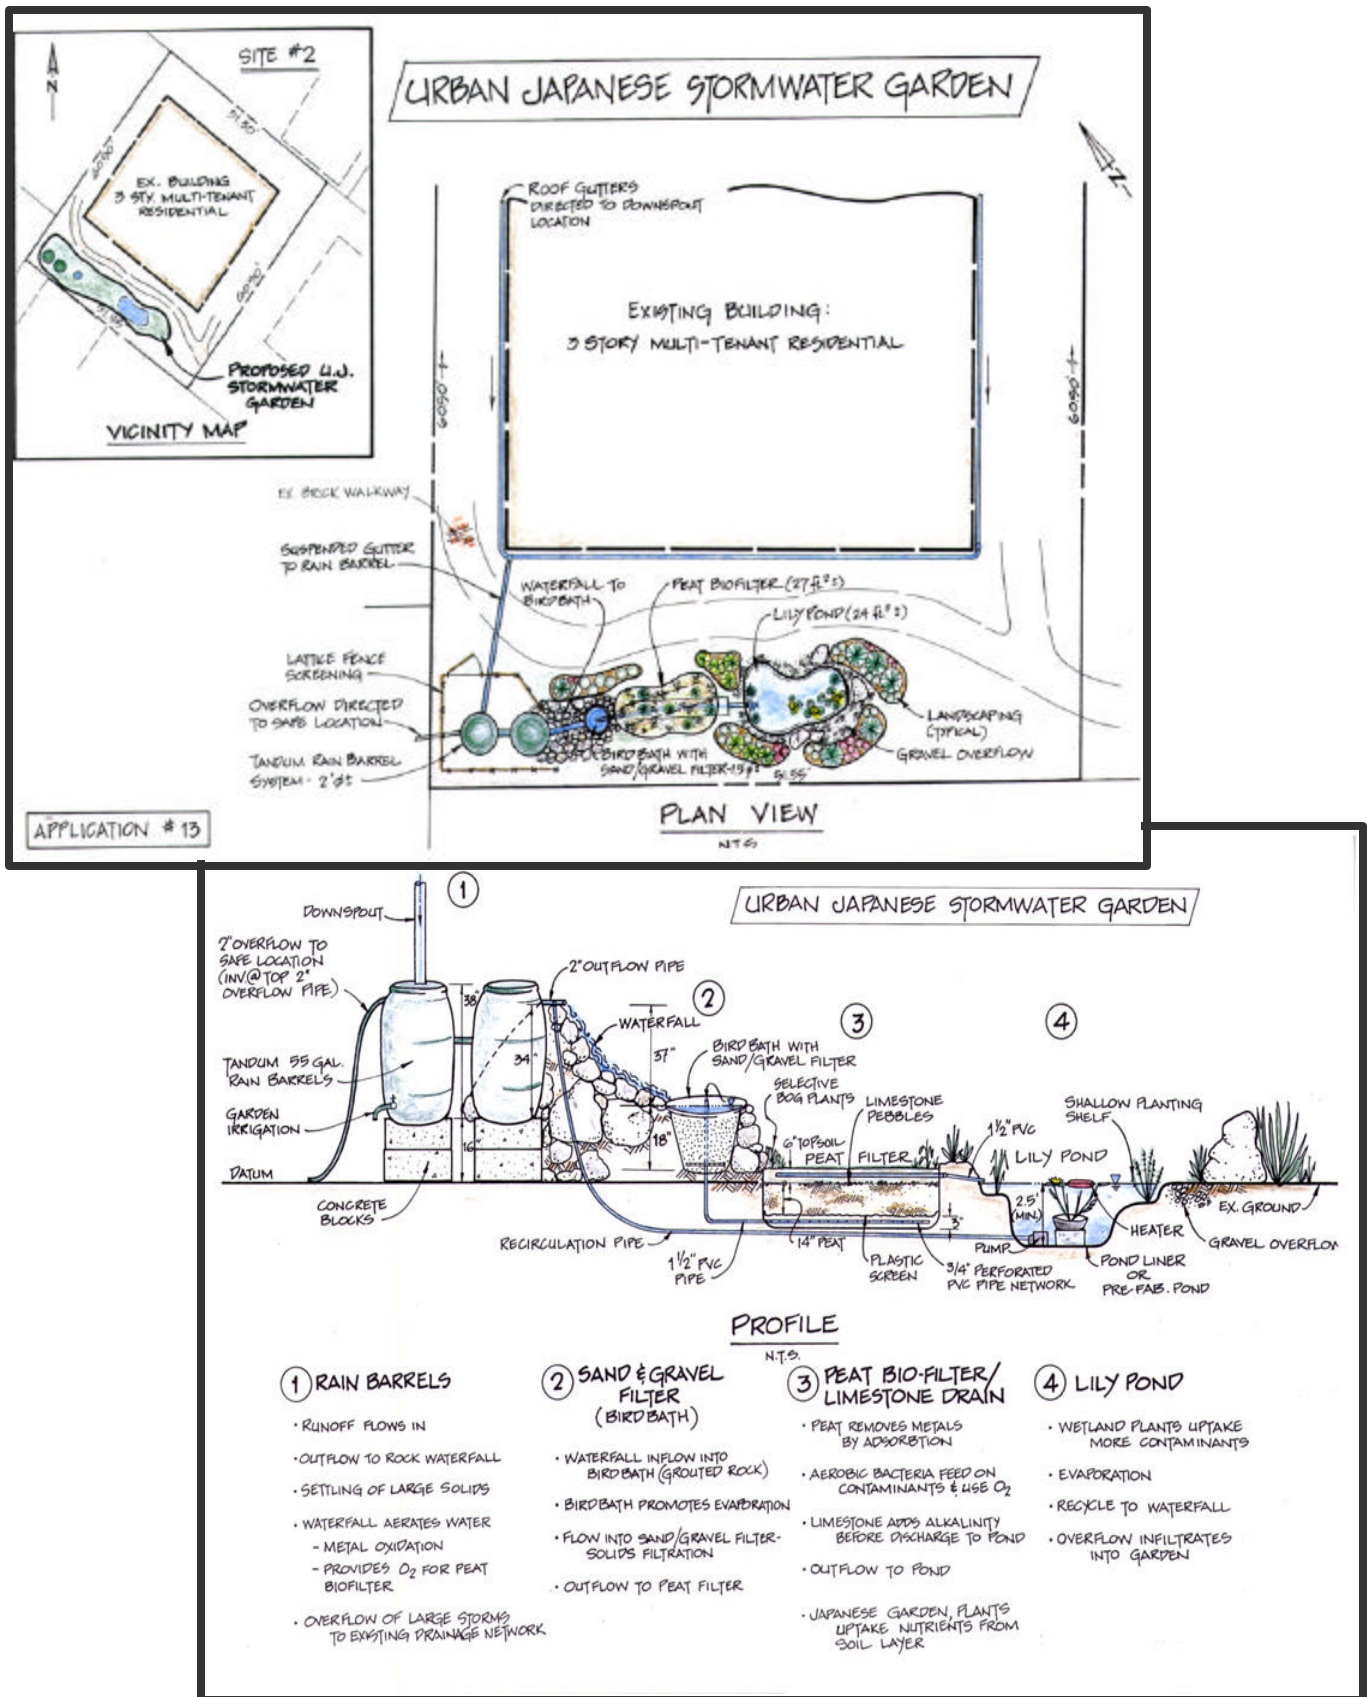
Illustration of a typical stormwater management concept plan (Sourial and Claytor, 2002)(the figure shows the level of detail typical of a stormwater management concept plan)
